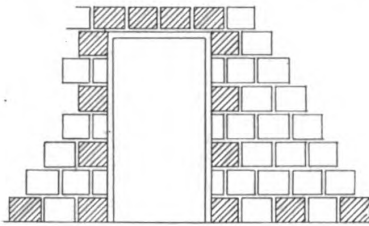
A typical layout for a doorway in a hollow tile partition. The shaded tile indicate porous tile, which afford nailing surface.
